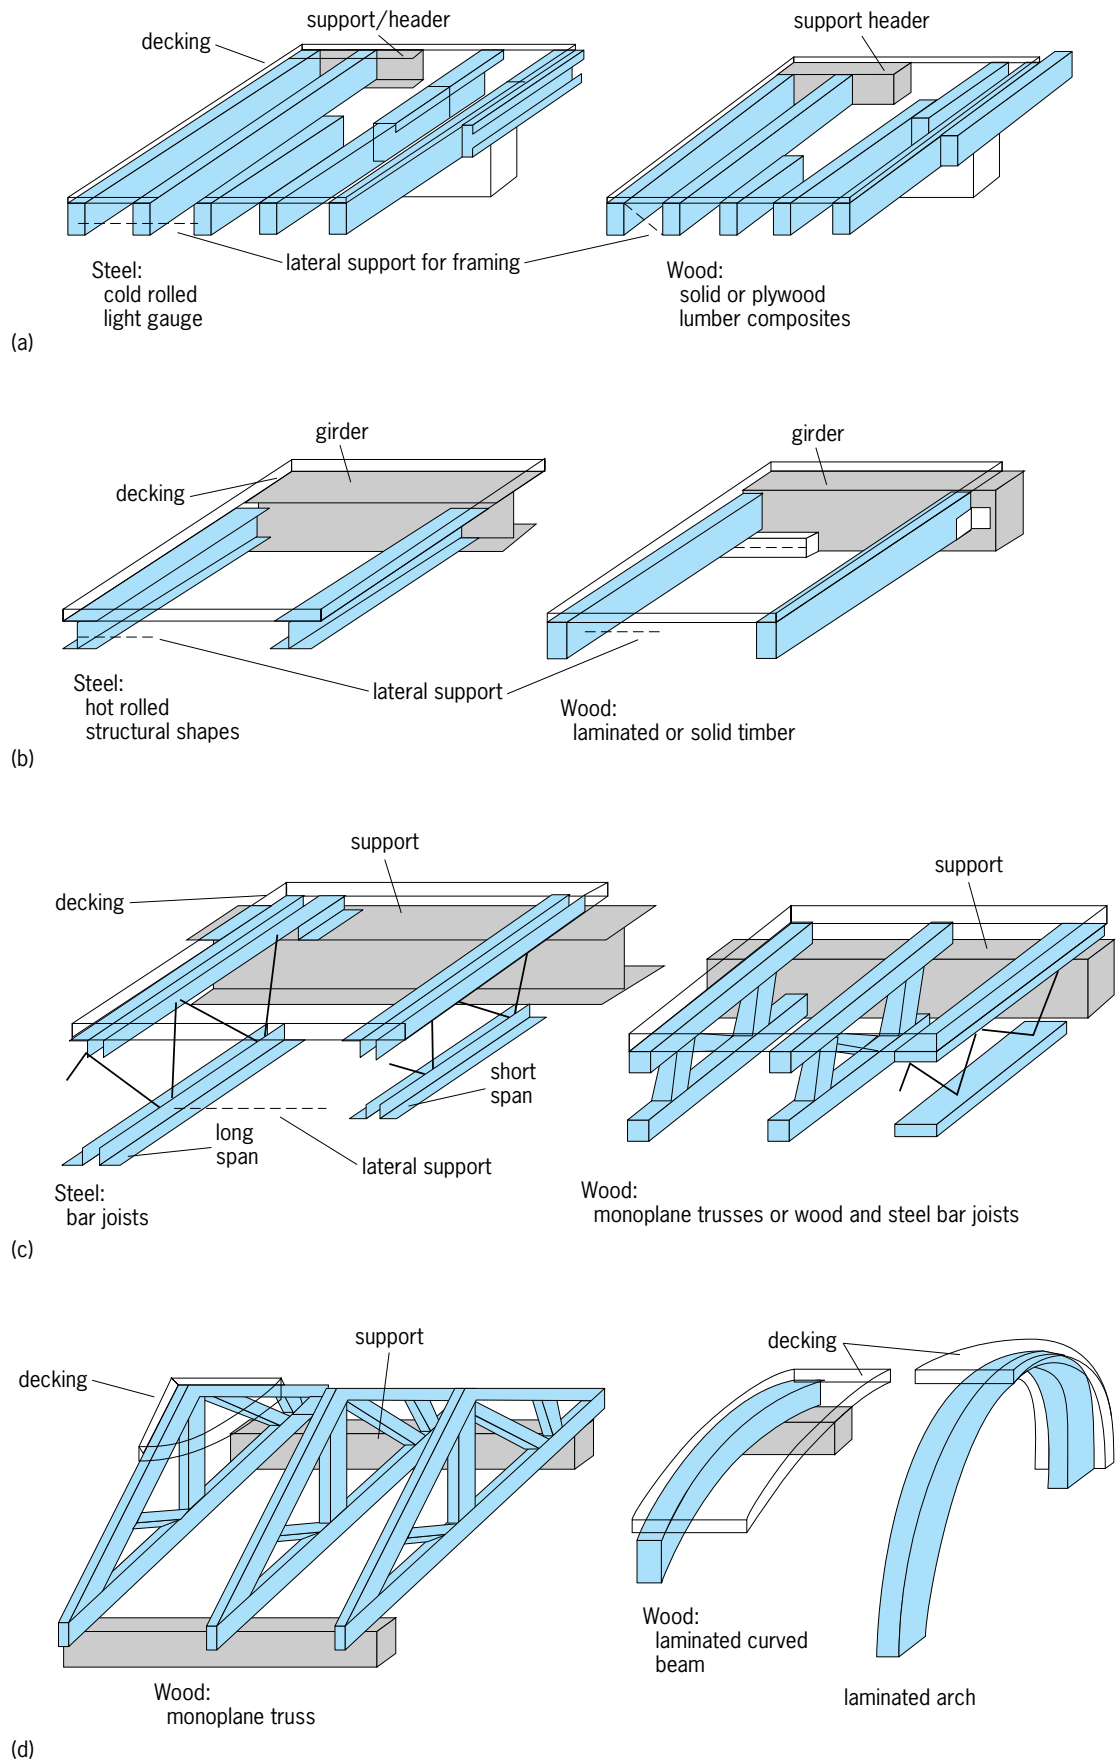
Types of roof primary structural framing. (a) Joists/rafters, close spaced. (b) Beams. (c) Trusses, flat top chord. (d) Trusses/beams, pitched/curved. (After Sweets Catalog, The McGraw-Hill Companies, 1993)
